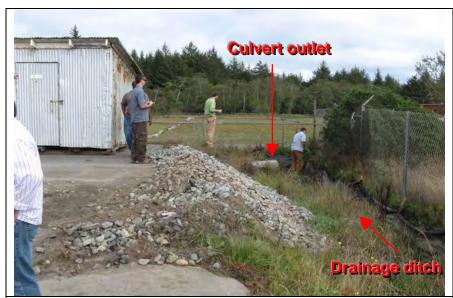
Closer view of sediment accumulation on imperious ground surface
